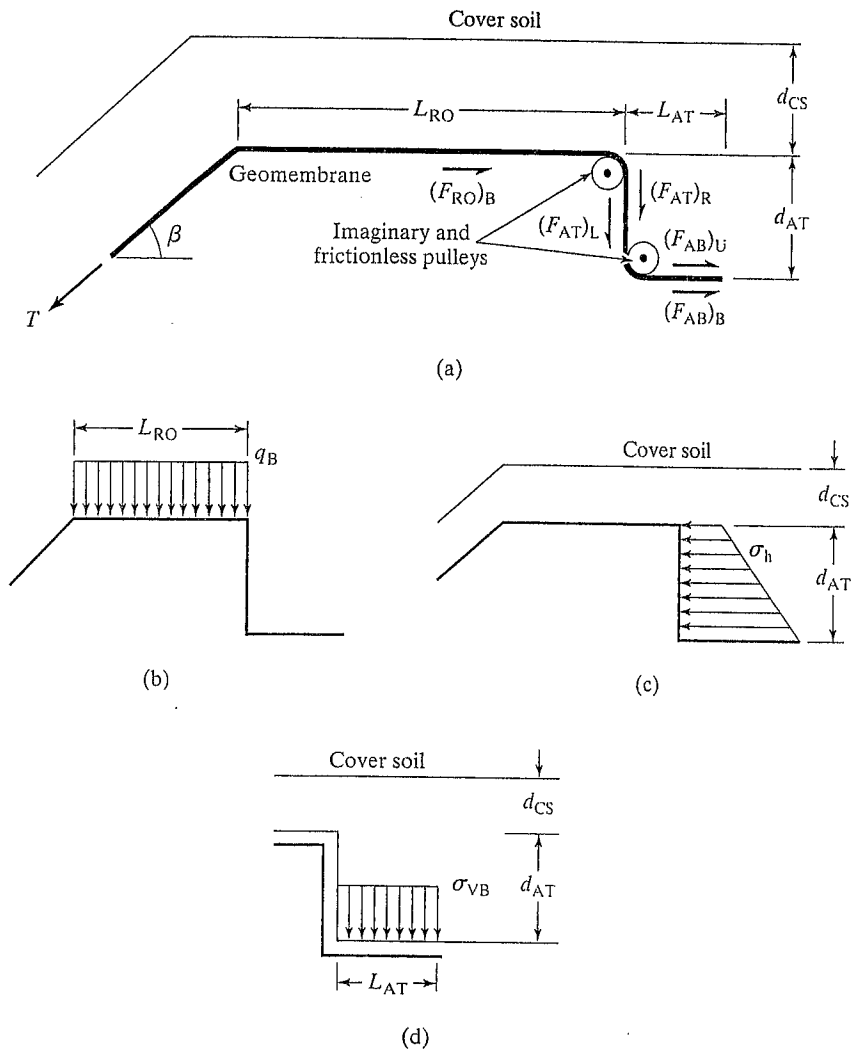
Cross Section of Geomembrane Runout Section with an L-Shaped Rectangular Anchor Trench and Related Stresses and Forces Involved
